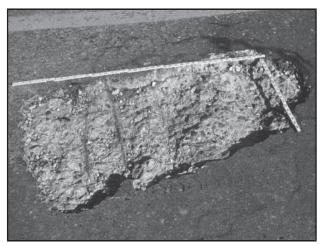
Spalls and Distressed Patches in Span 4 Deck
